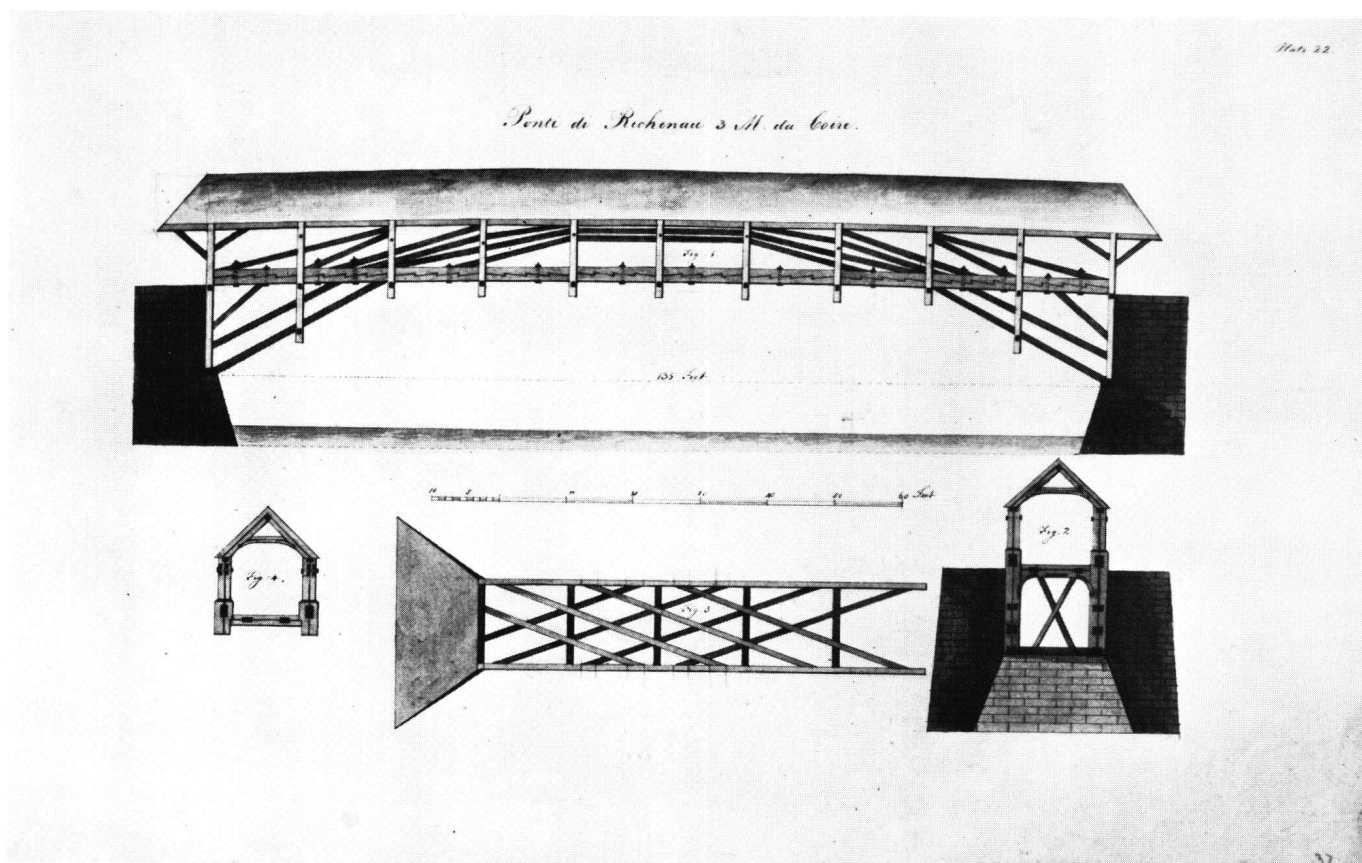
Short bridge at Reichenau; watercolour copy of a print after Michael Shanahan showing plan, elevation and sections
